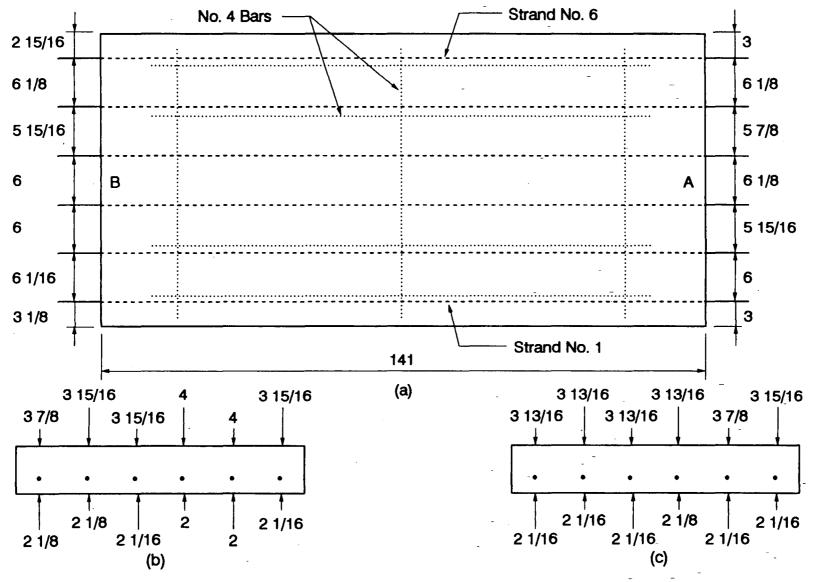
Specimen No. 14-6.0DC-1 (dimensions shown in inches):
